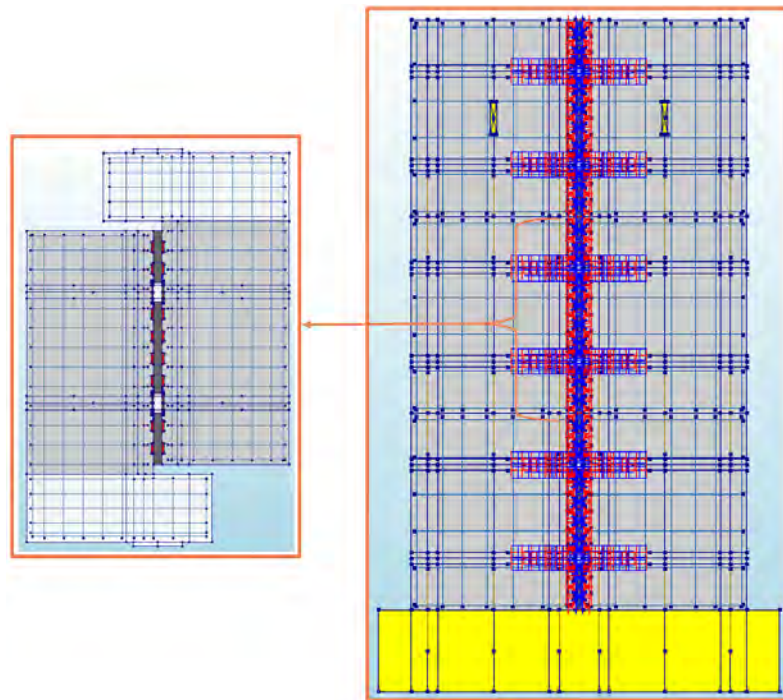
Vertical connection modelling in the global detailed shear wall model
